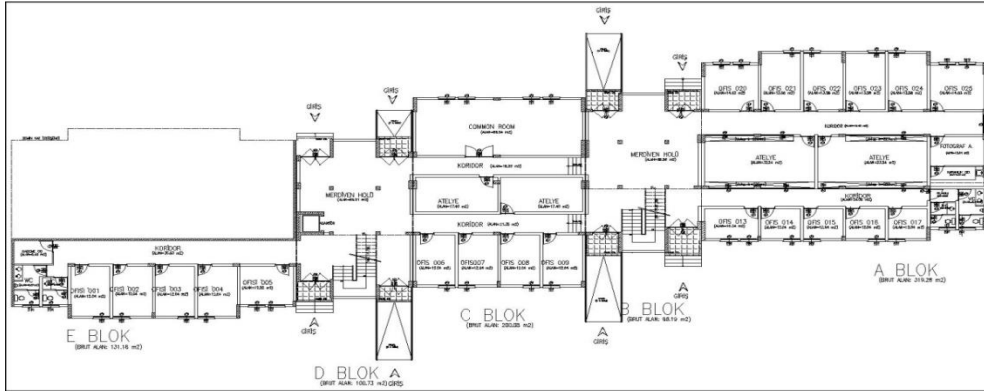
Ground Floor Plan (Architecture Department Archive)
